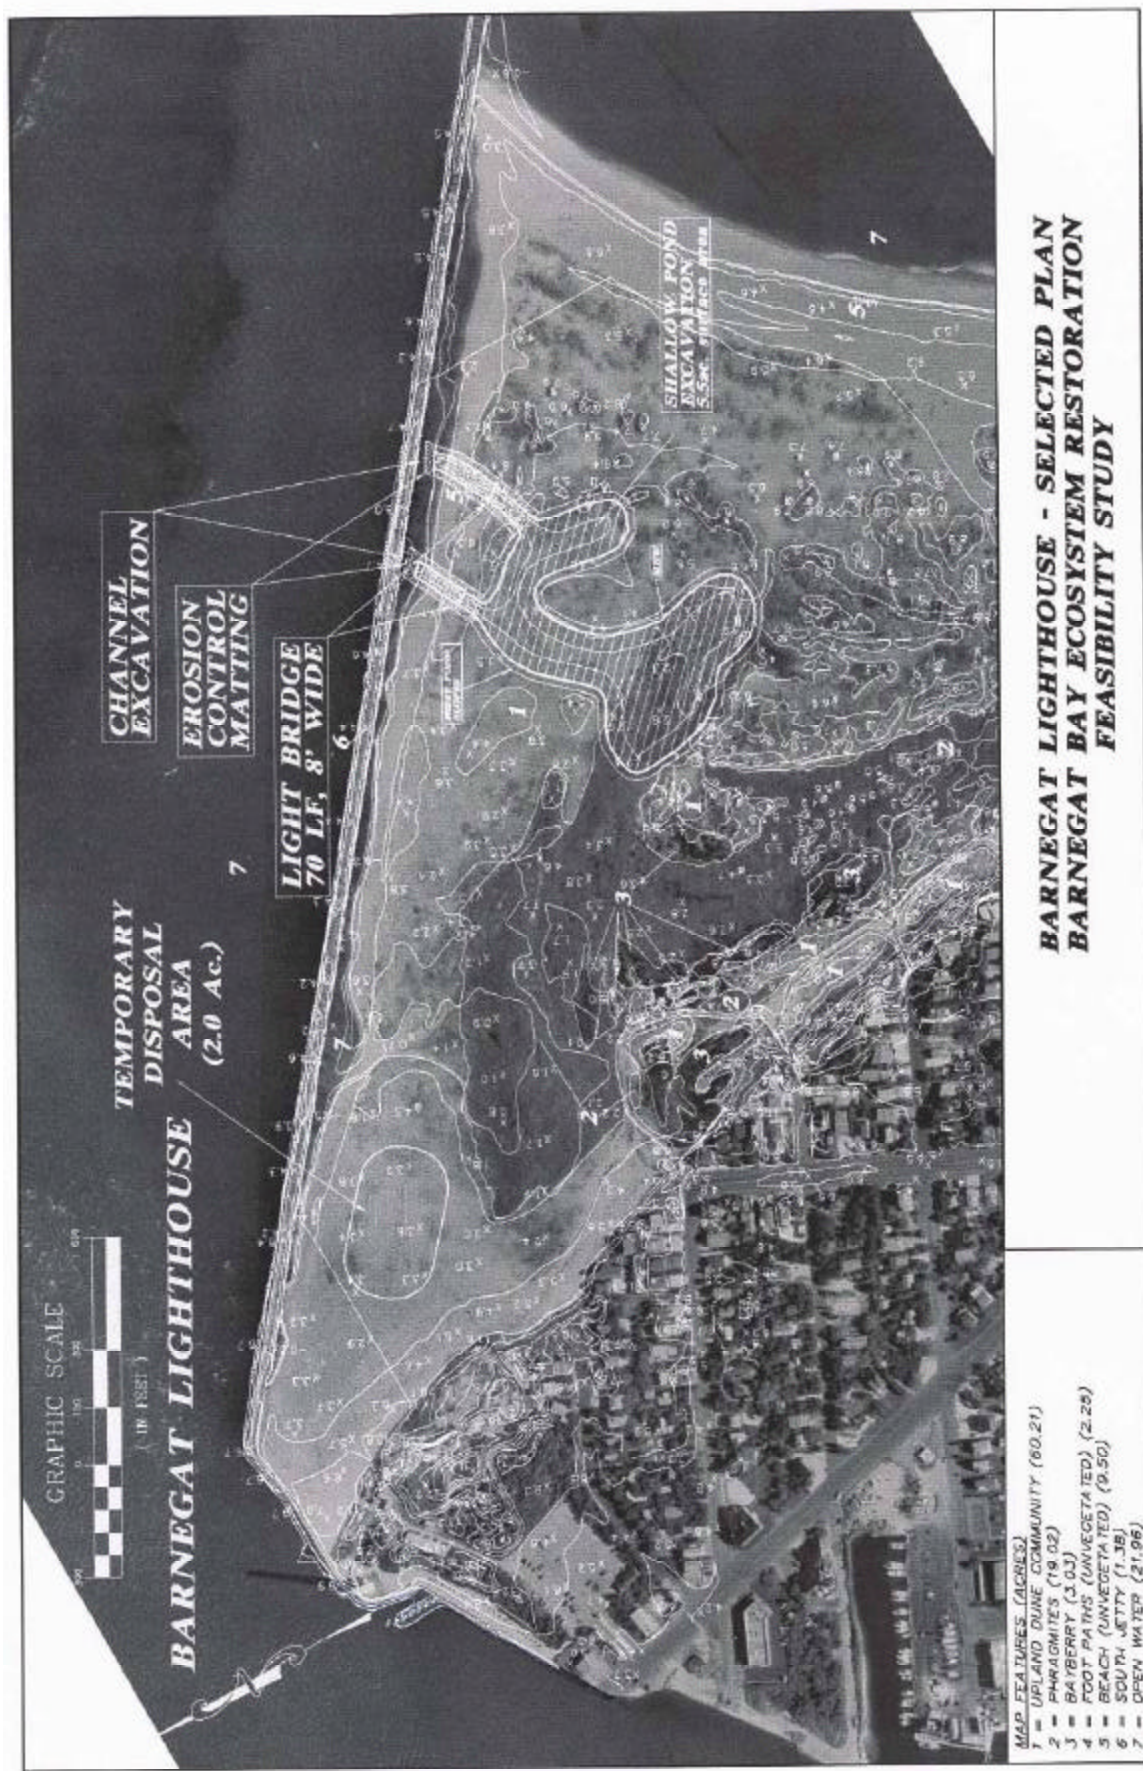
BARNEGAT LIGHTHOUSE-SELECTED PLAN
